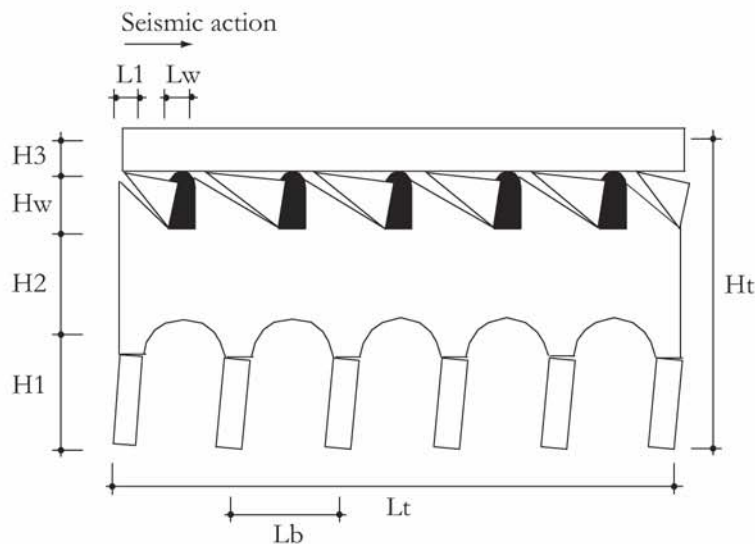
In-plane possible collapse mechanism for LW1 lateral wall.
